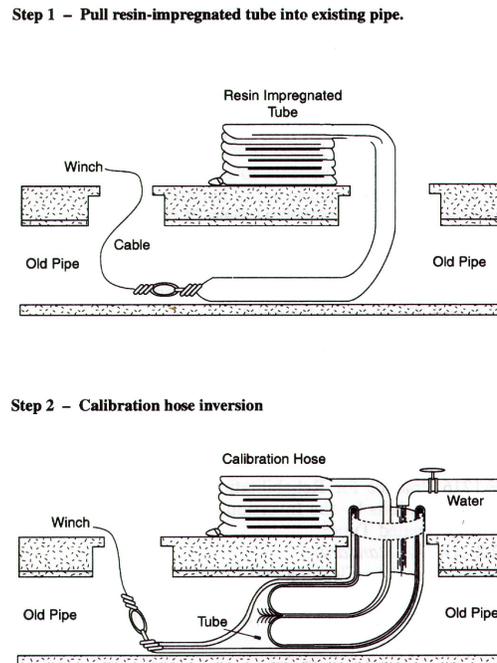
Drawing. Pulled-in-place Installation Method for Cured-in-place Lining.⁽⁸²⁾
